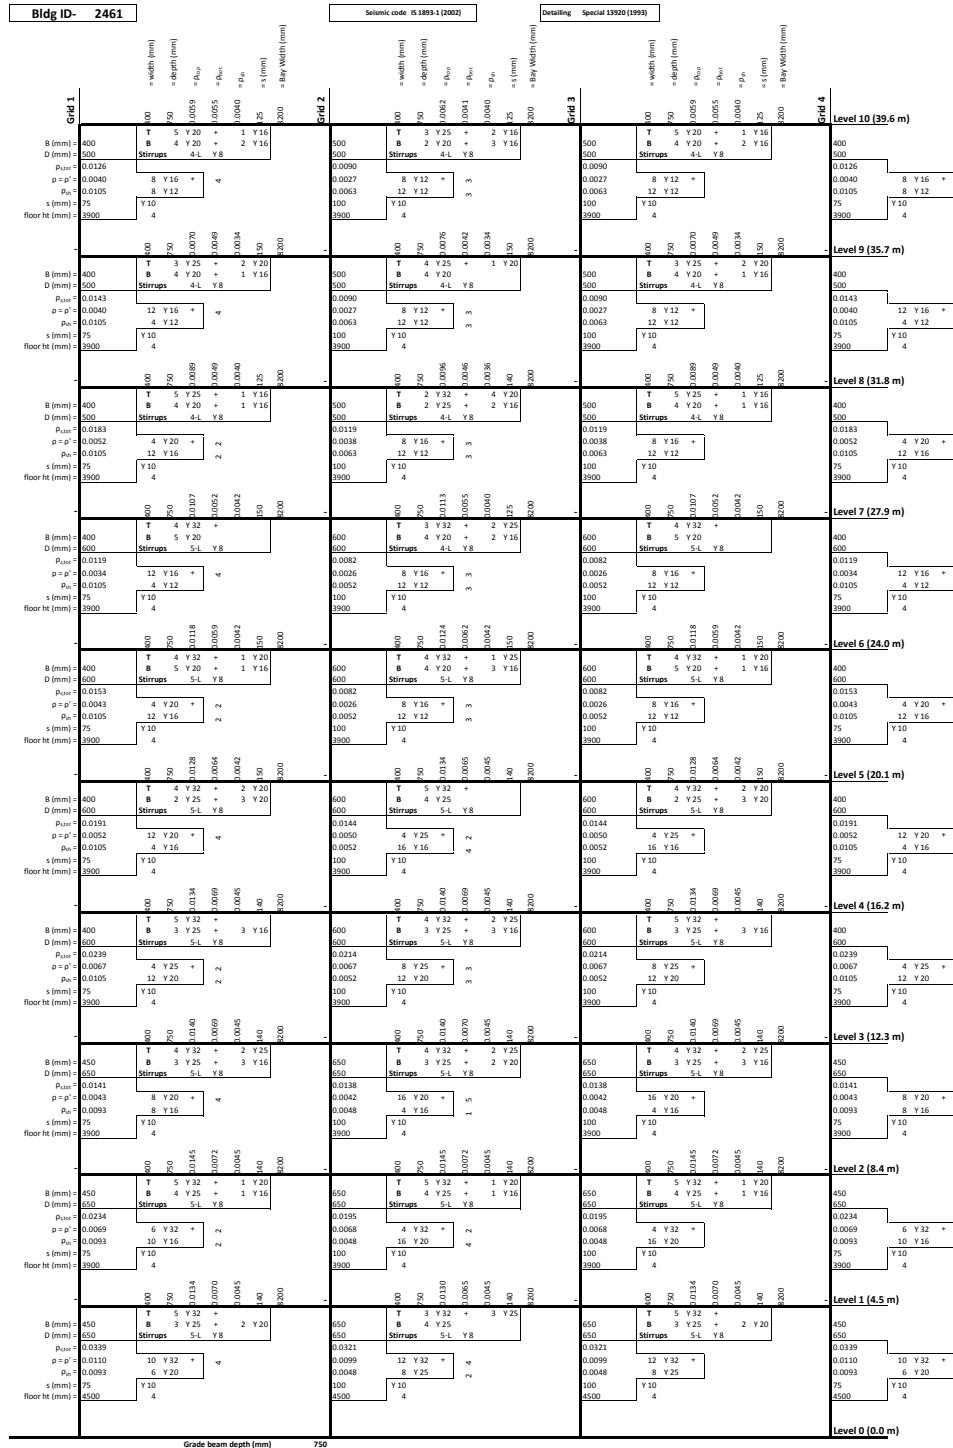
Required longitudinal reinforcement for building ID 2461
